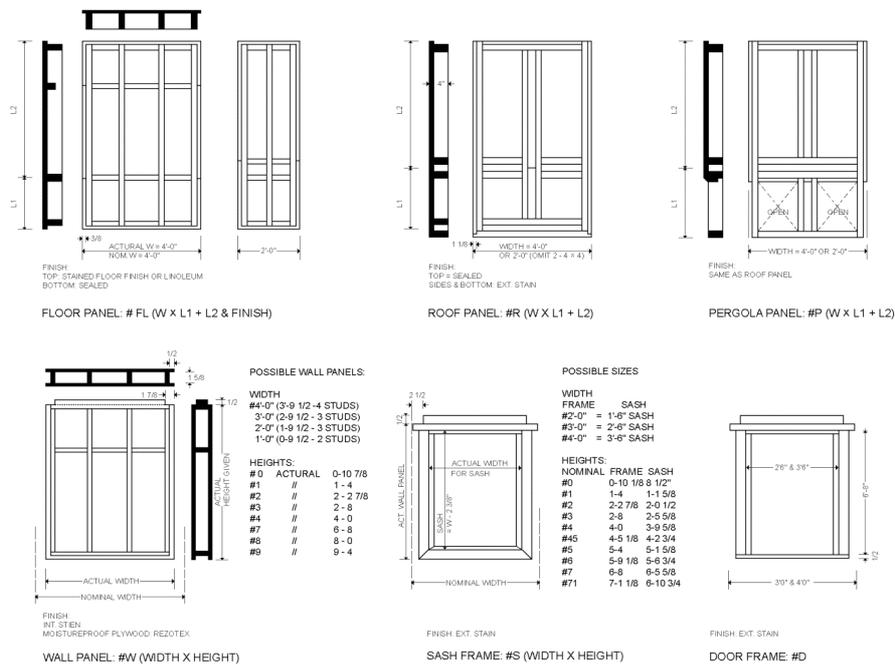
Details of the floor, roof, pergola and wall panels, sash and door frame redrawn by the author (Garland 2585).
